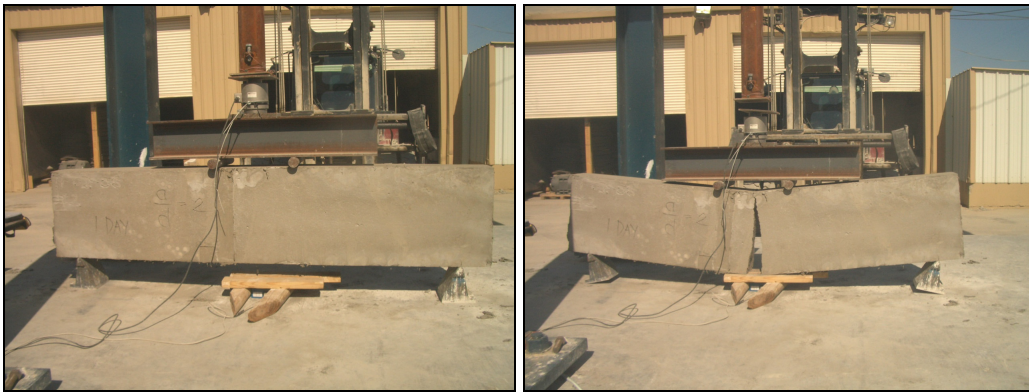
Beam for 1<sup>st</sup> batch concrete cast on 11/2/06 for 7 day test;
